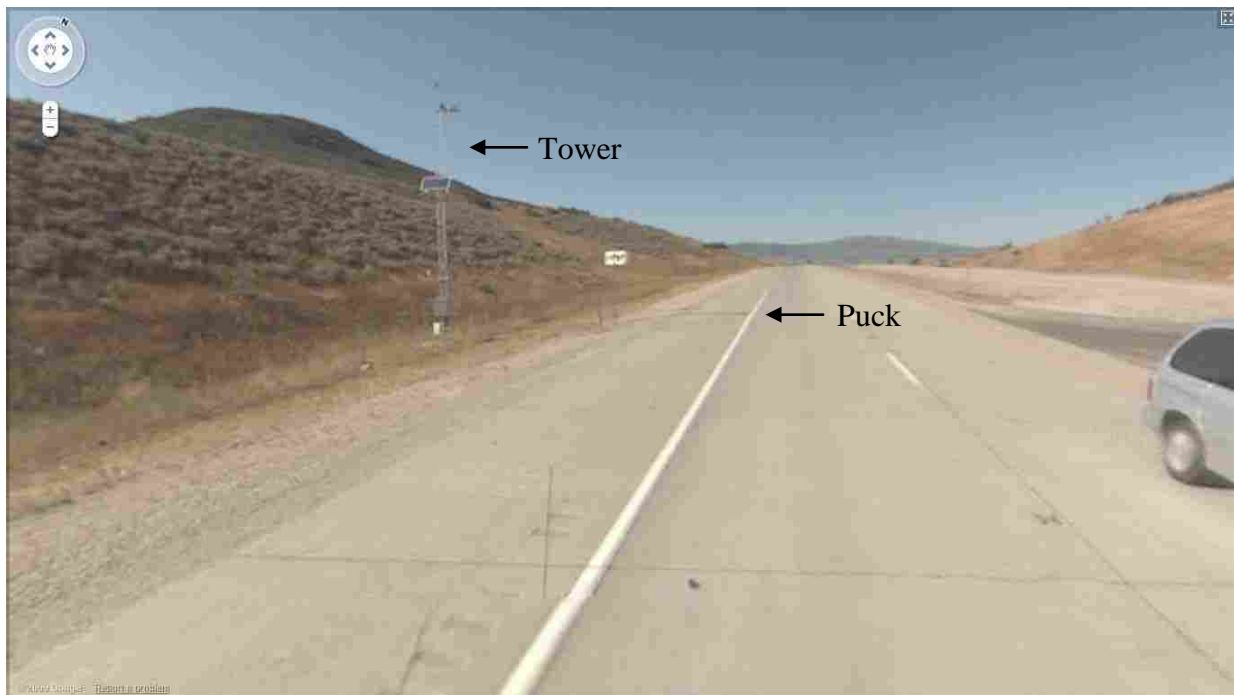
Google Street View showing concrete pavement at station UTMFS (Google 2010).
